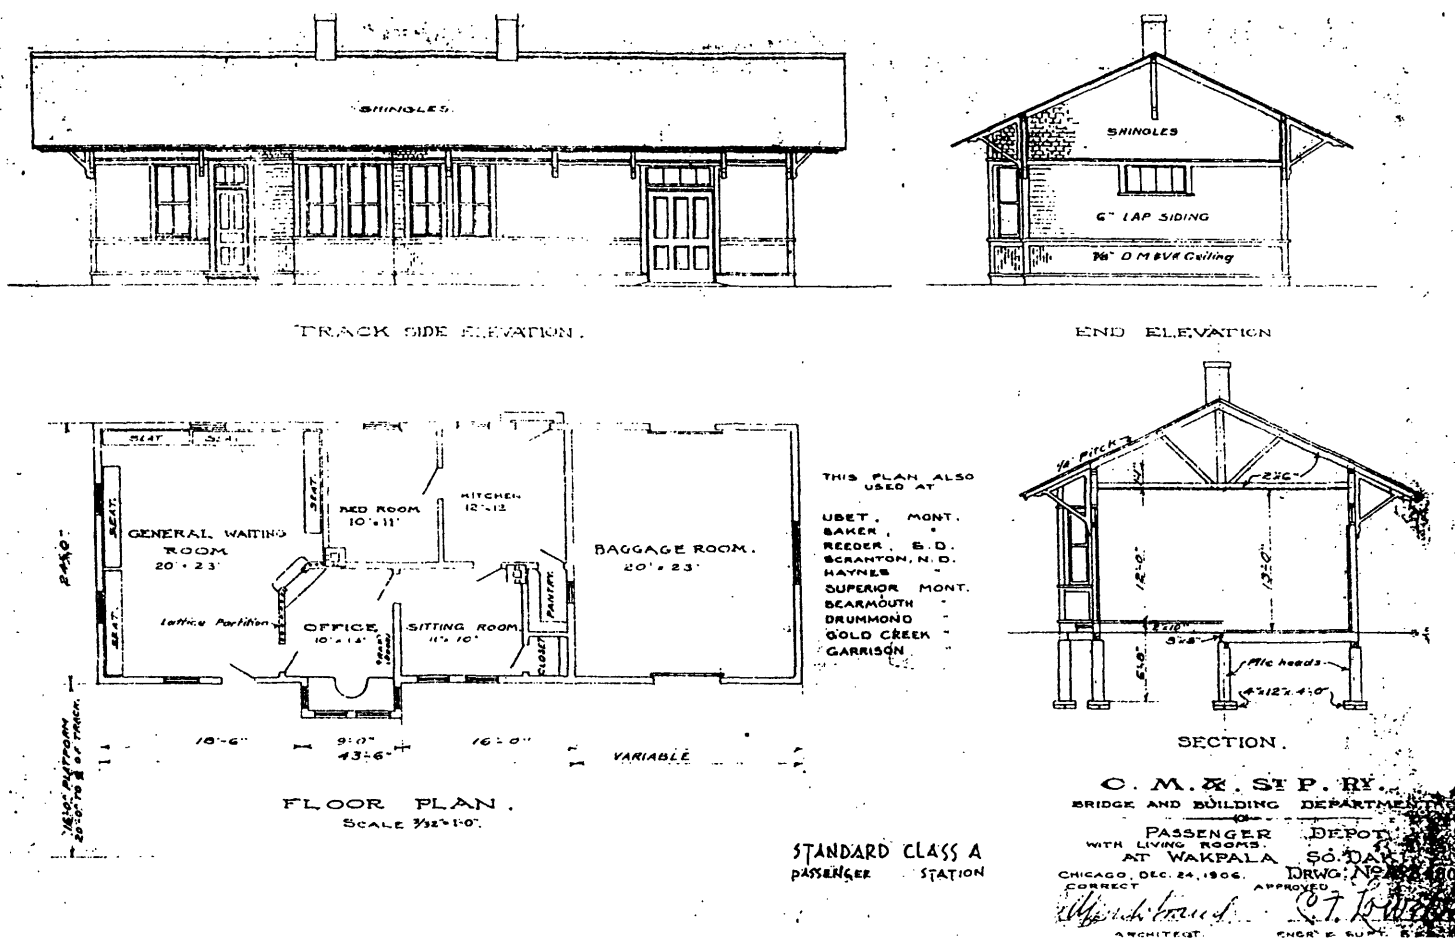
example of a standardized Milwaukee Road depot plan (author's collection)
